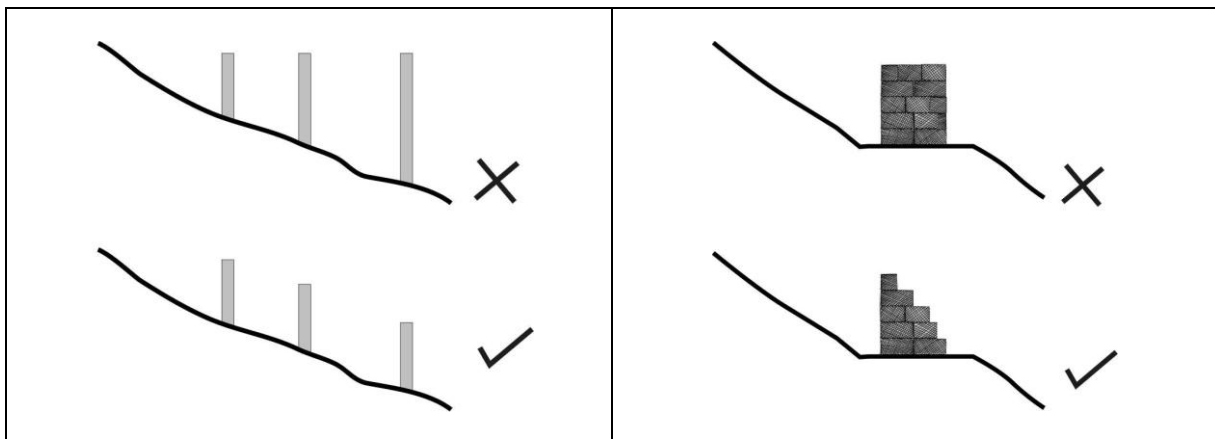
Terracing Profile for Concrete Barrier Wall
